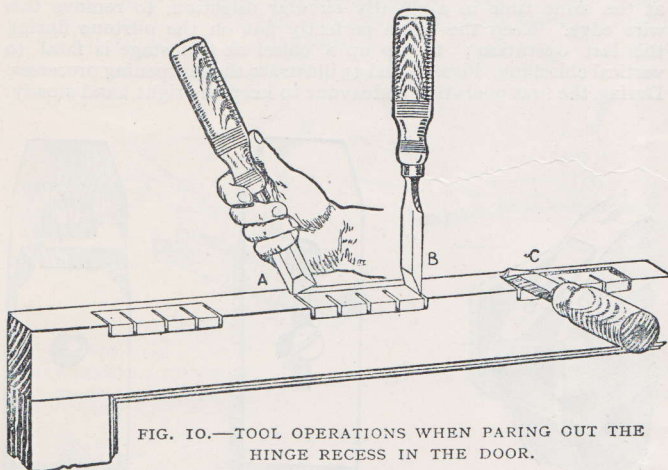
TOOL OPERATIONS WHEN PARING OUT THE HINGE RECESS IN THE DOOR.
